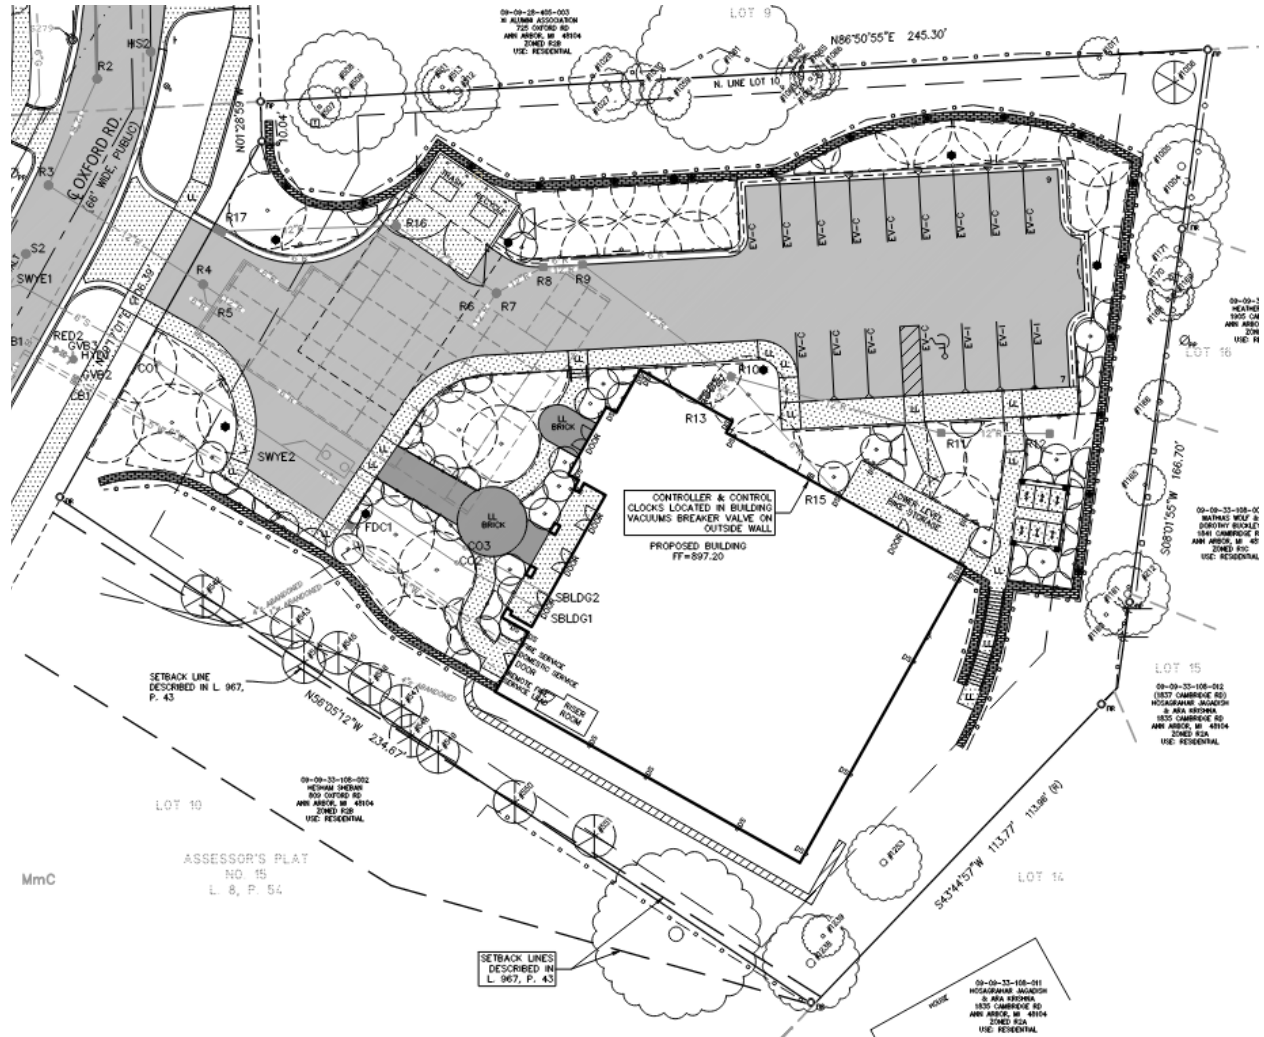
Drawing showing the proposed layout of the site with a rectangular building to the south and a driveway and parking lot to the north. There are retaining walls around the building and trees around the perimeter of the site. The site is accessed from a curb cut on the east side of Oxford Road.
